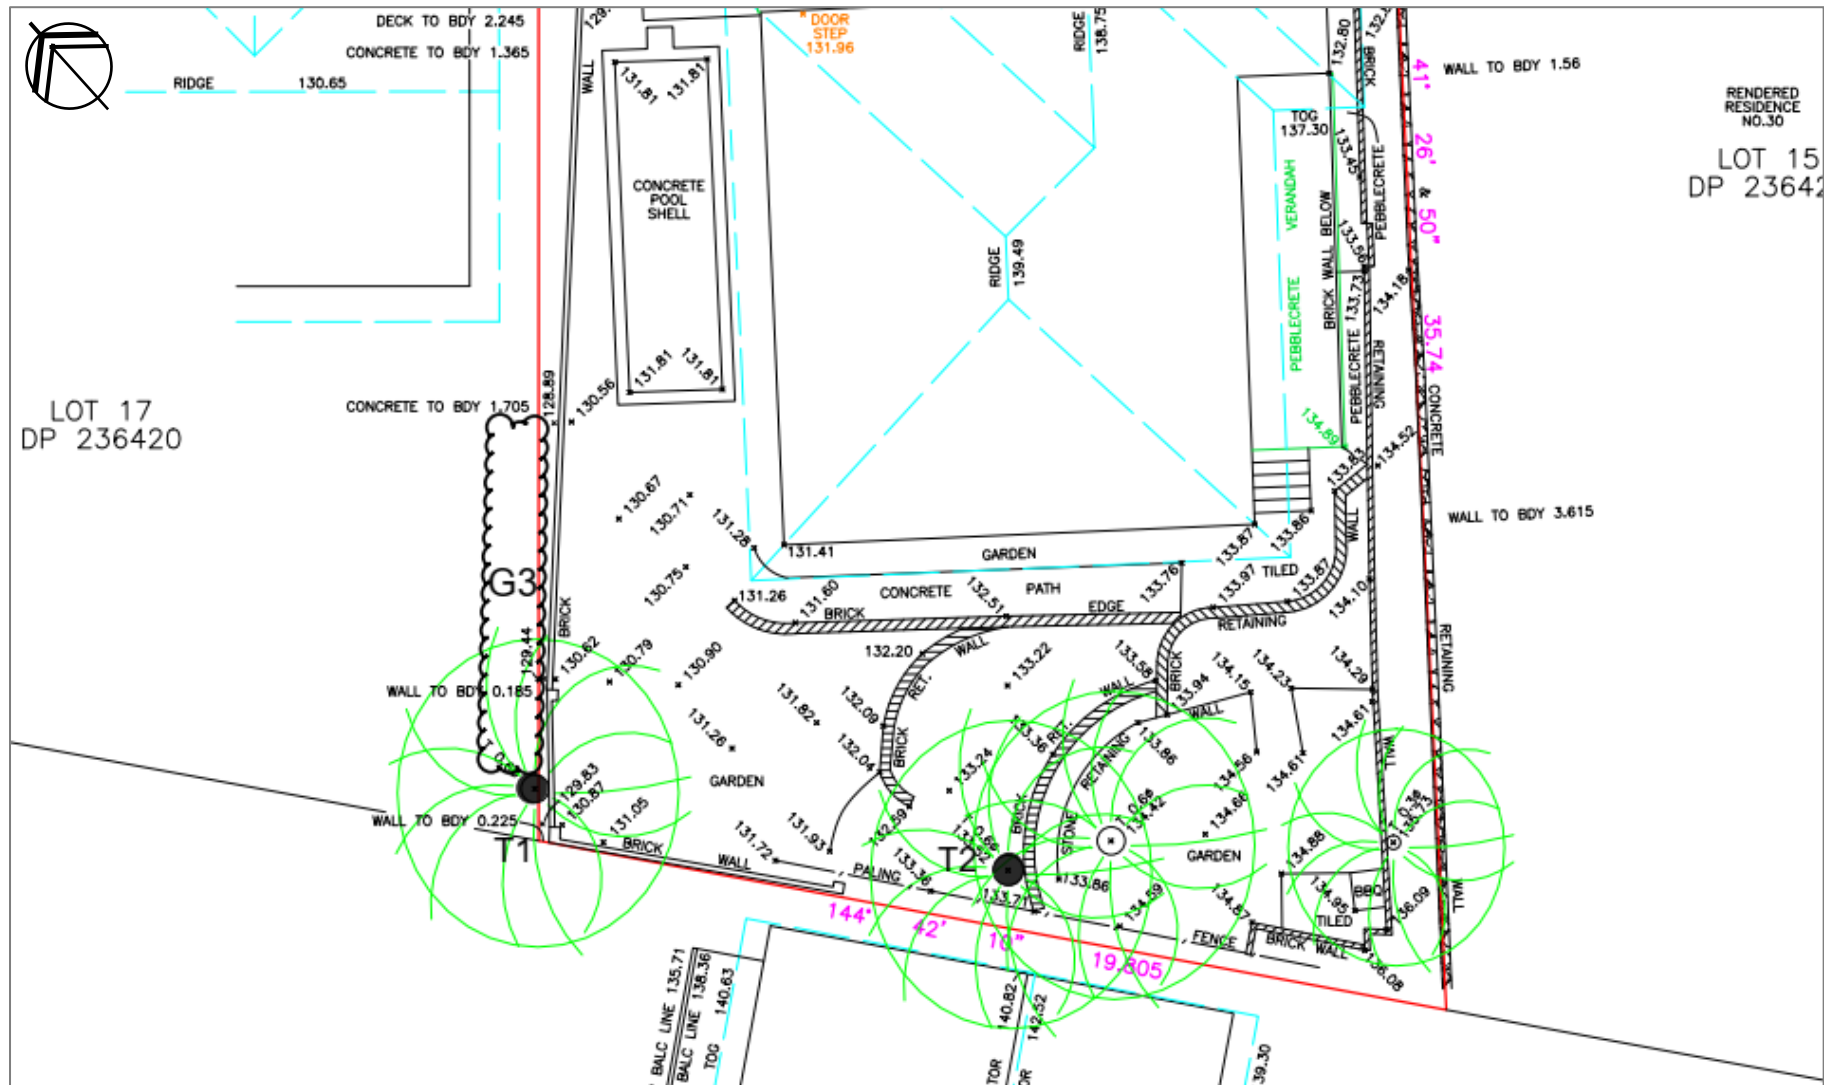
Excerpt of Survey Plan. Marked up by C Hughes (NOT TO SCALE).
